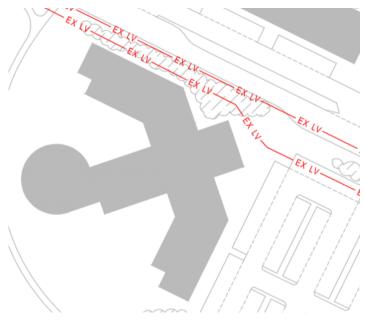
Existing SSE LV apparatus and proposed NUC-01 and NUC-02 buildings
